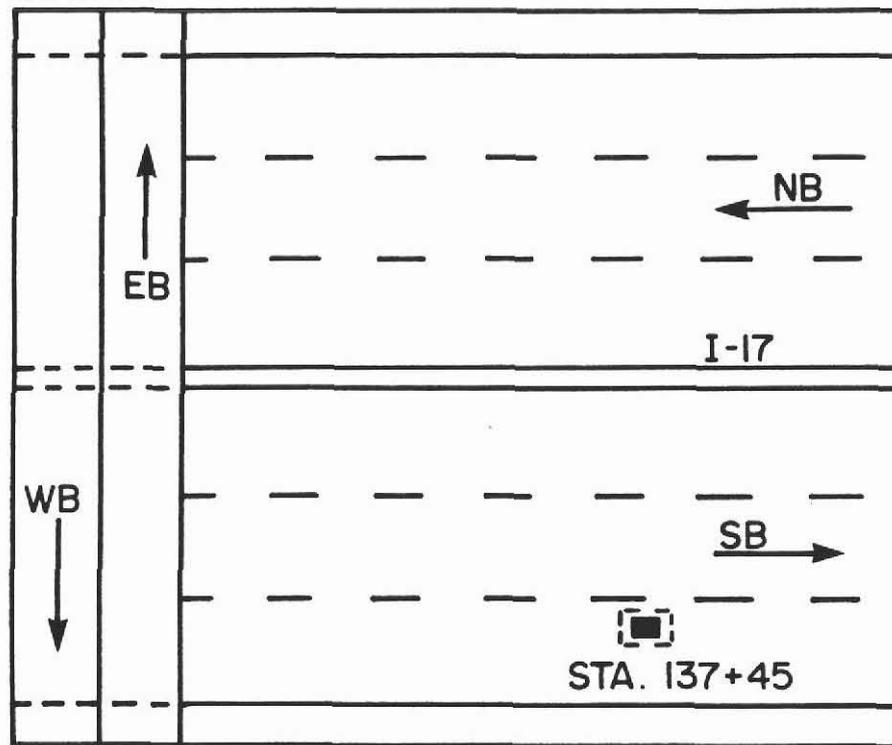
LOCATION OF ROADPATCH TEST SECTION
